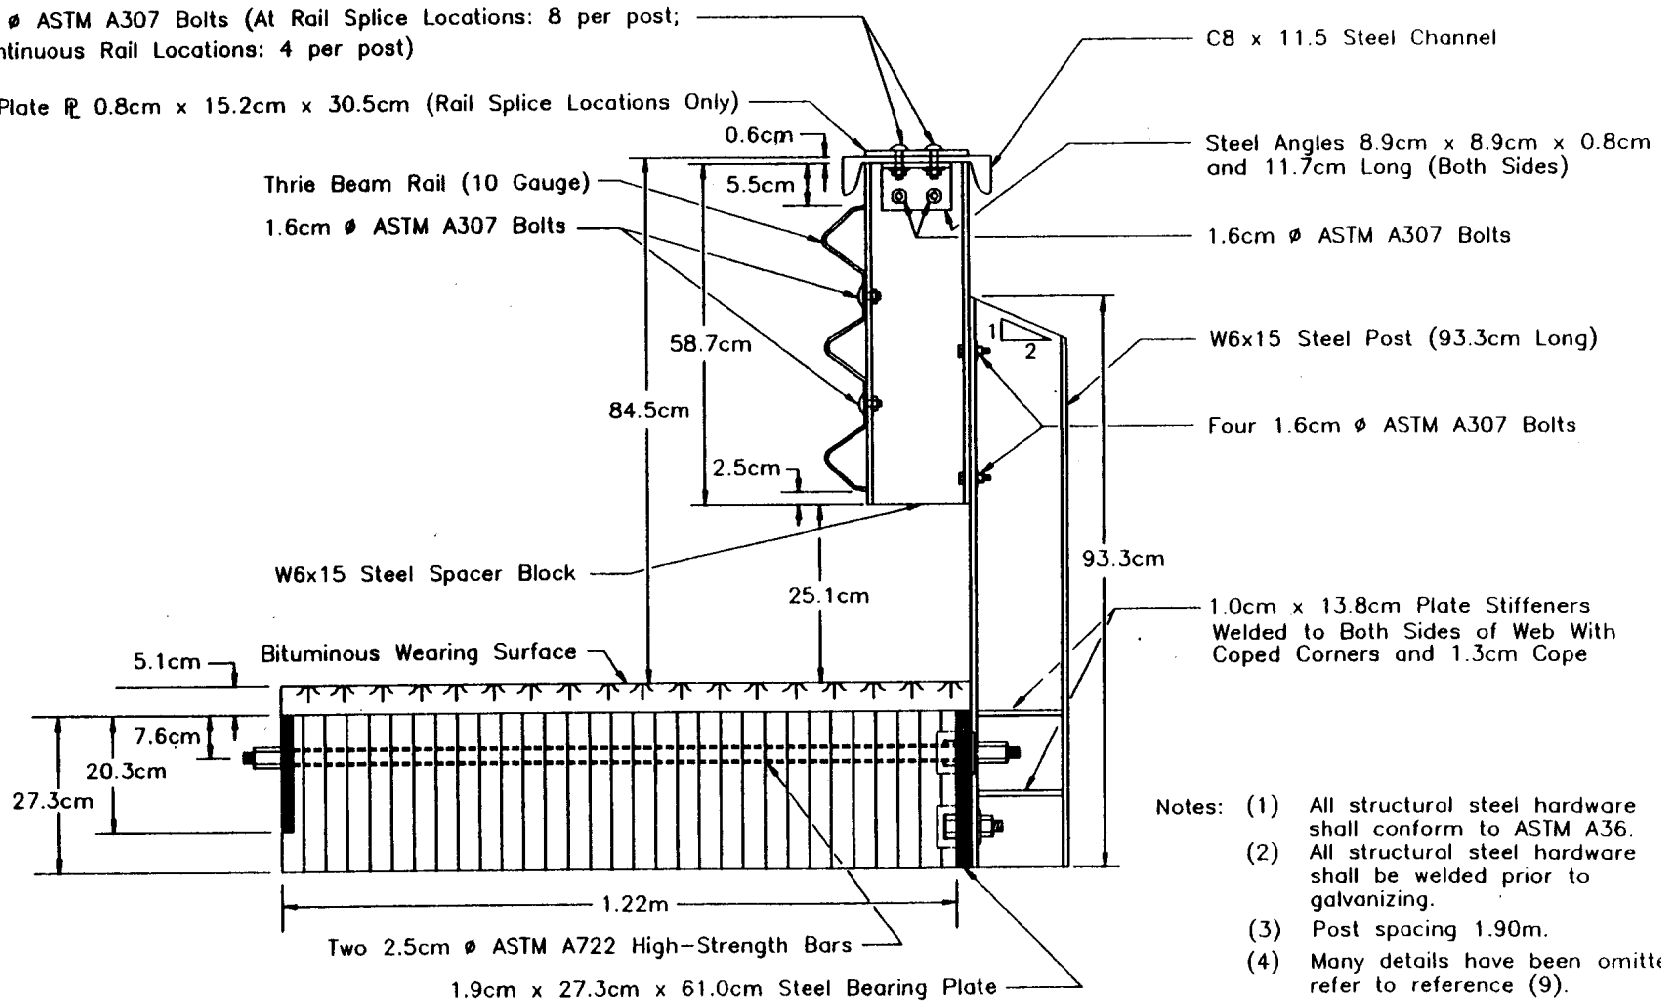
Single Steel Thrie Beam Bridge Railing or "Steel System"
